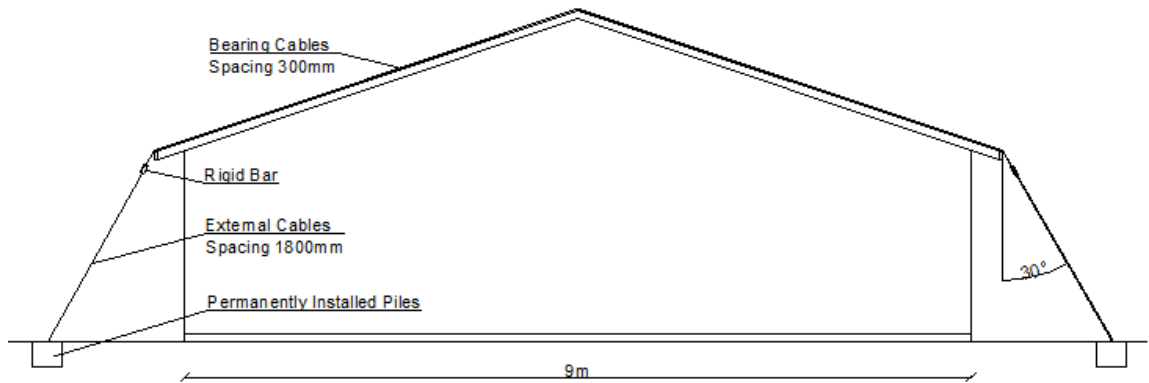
Elevation view of proposed retrofit system as applied to a gable-style roof
